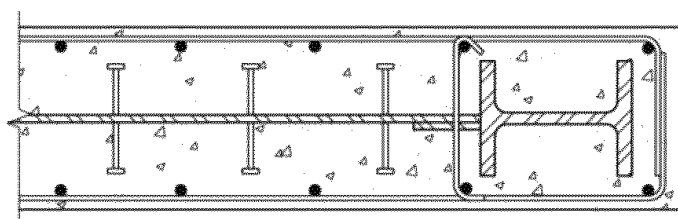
Concrete stiffened steel shear wall with composite (encased) boundary member.
